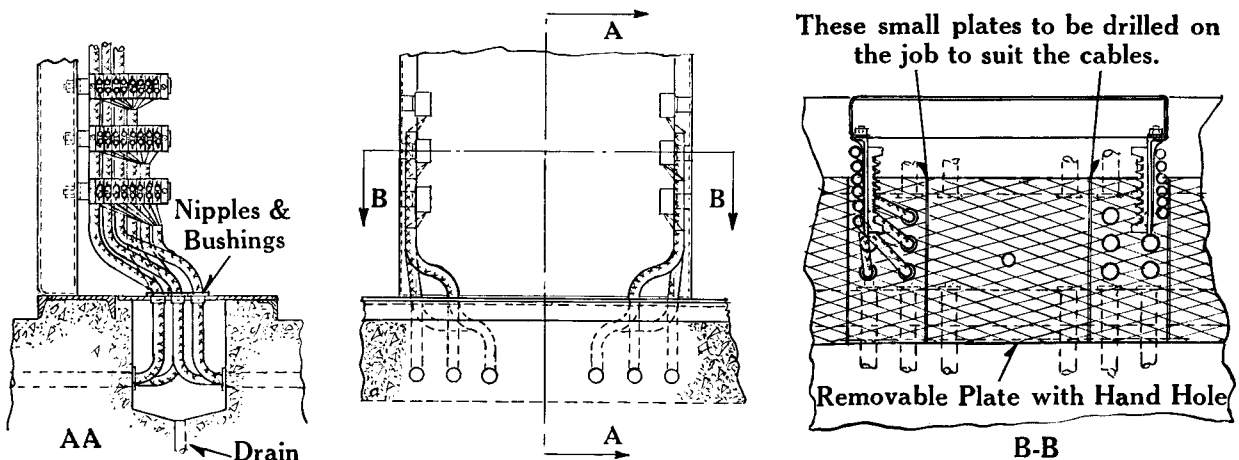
This arrangement shows conduits terminating in a trench. This is an excellent scheme especially when there are a number of cables and conduits involved. (Steel panel switchboard shown).
